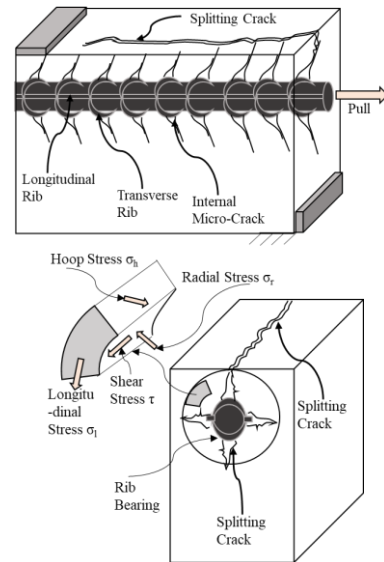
Splitting failure mechanism and stress component in beam-end specimen
